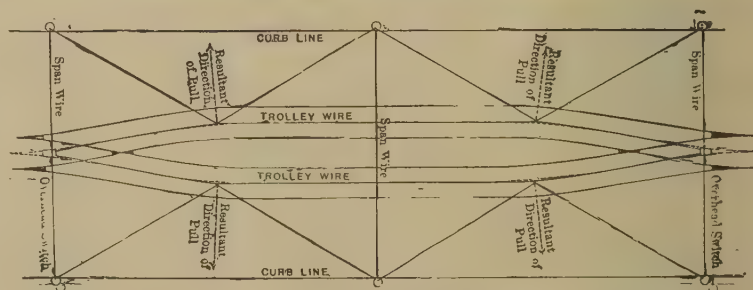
OVERHEAD WIRING FOR SINGLE TRACK TURNOUTS.
